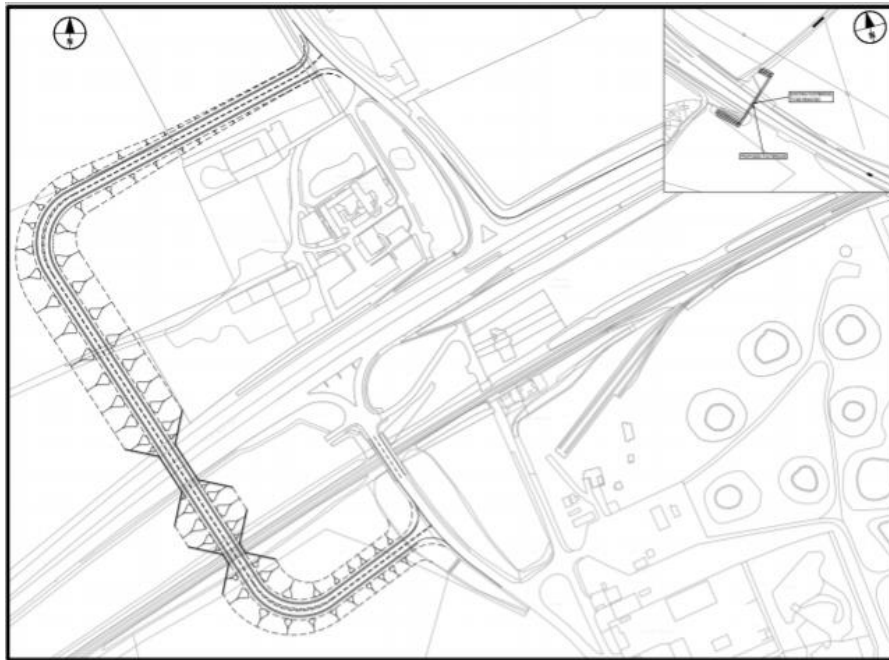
Option 4: Connection of Cantley Lane South to B1172 Norwich Road
